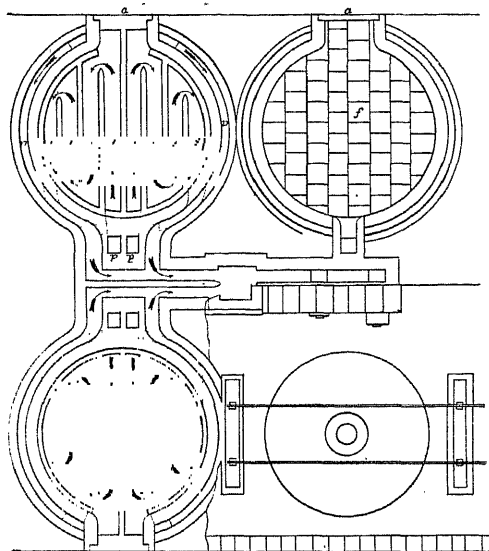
Four Sectional Plans of "Breckon and Dixon" Coke Oven.
